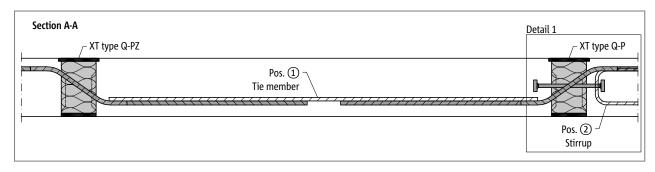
Schöck Isokorb® XT type Q-P, Q-PZ: Detail 1; Reinforcement connection tie member
